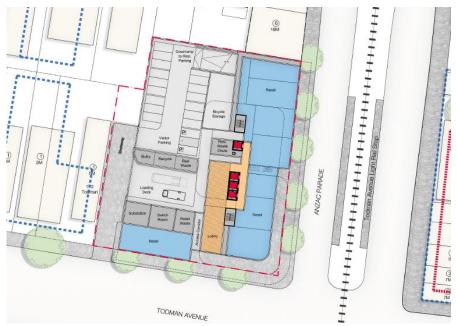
Ground floor retail tenancies Source: Bates Smart
